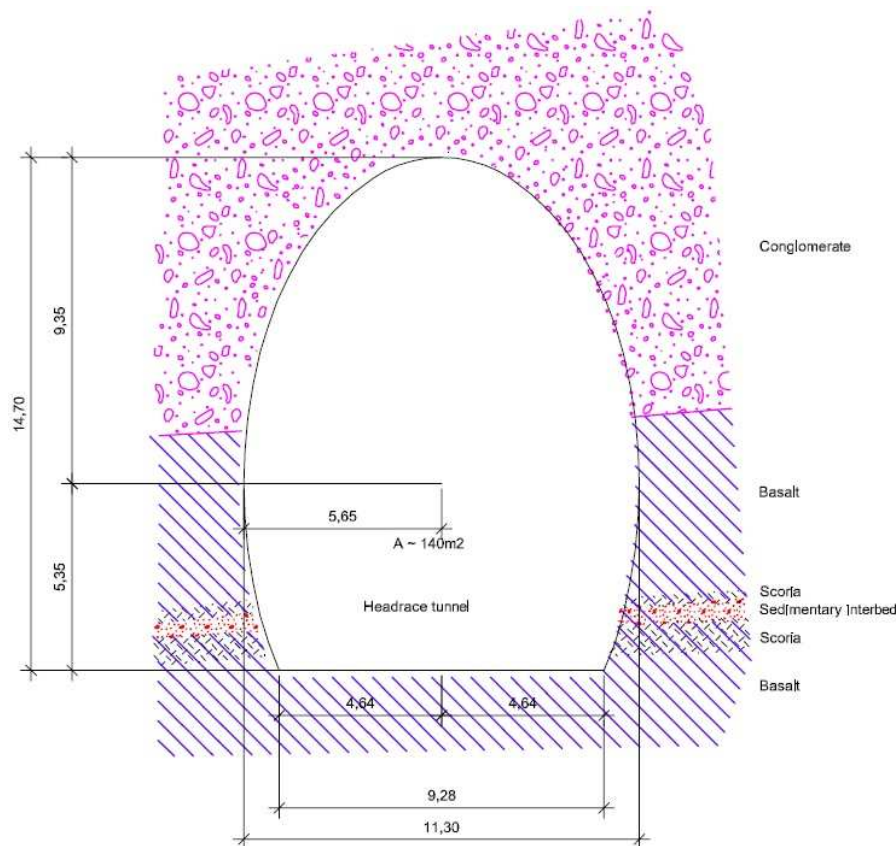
Headrace tunnel cross-section with possible rock bedding [Hönnun, 2001].
